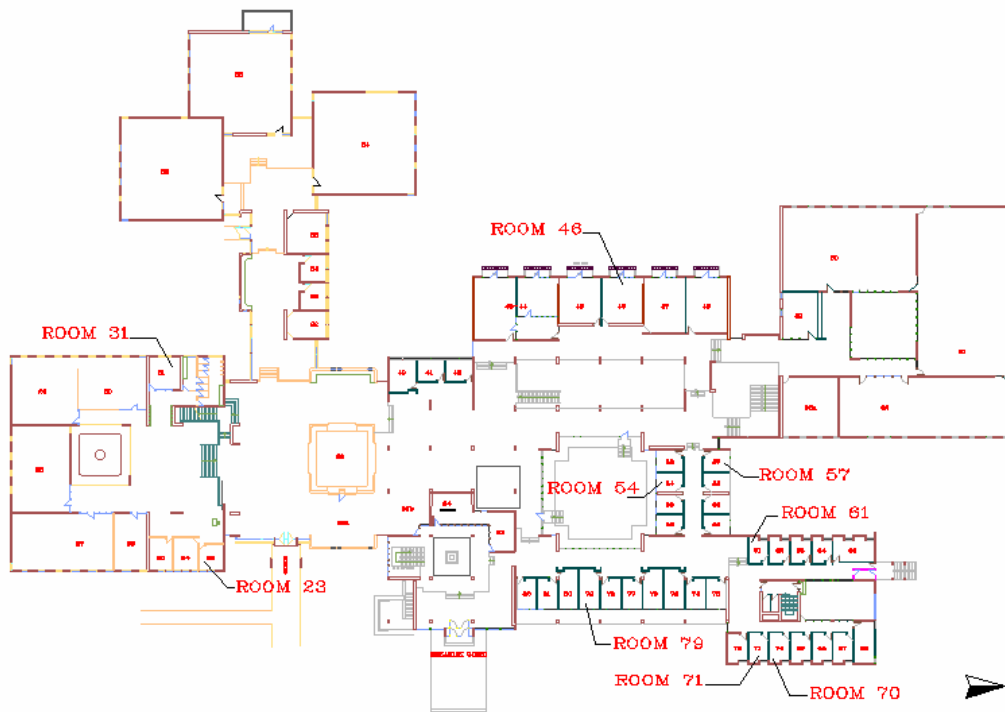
Ground floor plan of the case-study building: METU Faculty of Architecture. ( the course of building science 566)
